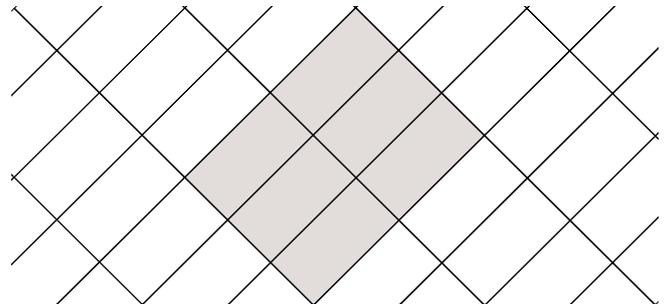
Vertical Sheeting – Stretcher Bond Pattern
